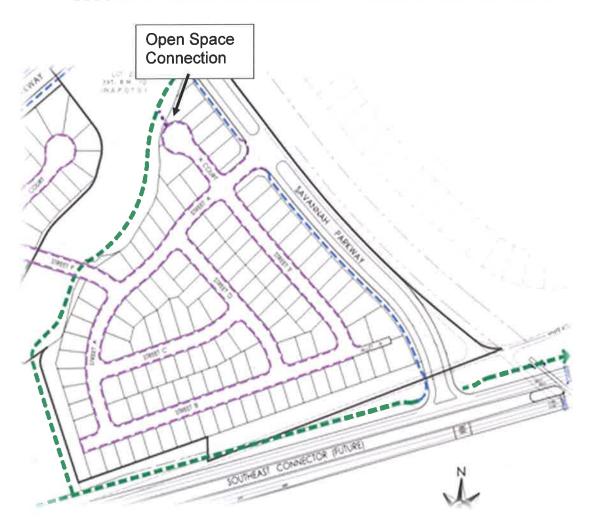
COURT CONNECTION TO OPEN SPACE VIA LOT C
